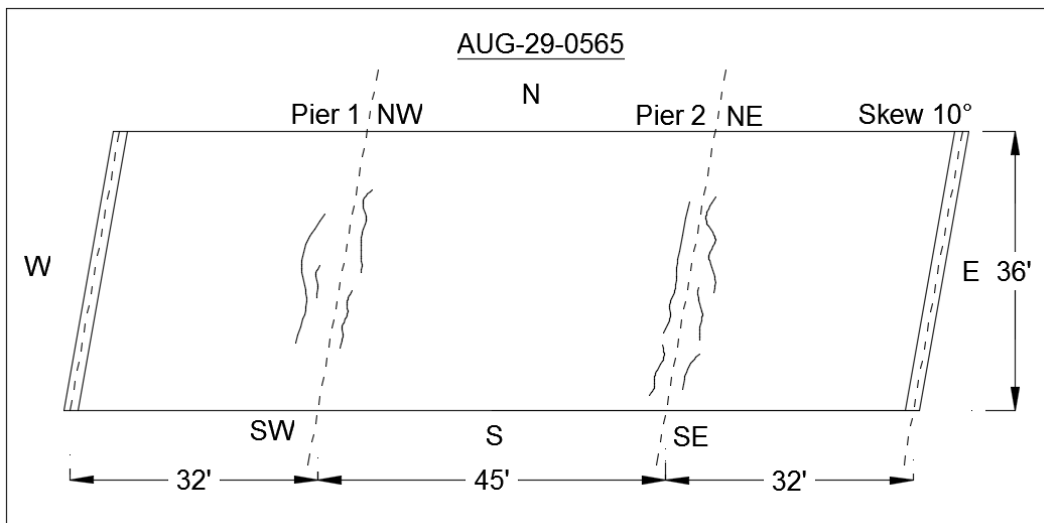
Bridge Inspection Pictures and Crack Map – AUG-29-565
